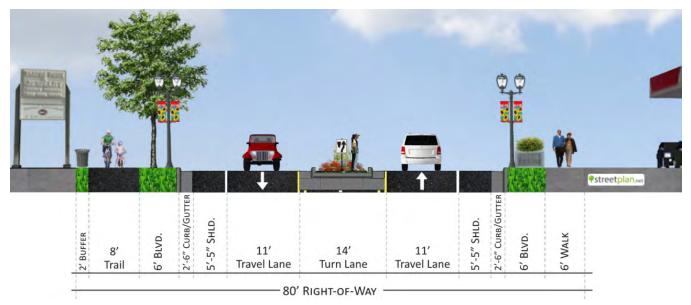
Illustrated typical section of Commerce Drive with multi-use trail. Source: Streetplan.net
